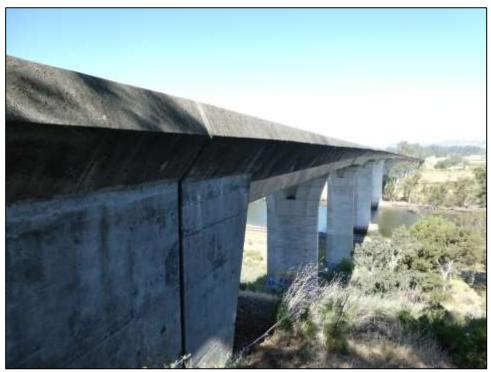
East abutment, camera facing southeast, June 1, 2022.
